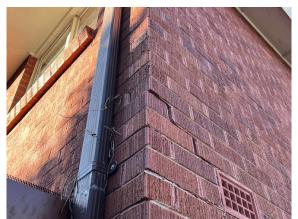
Cracking and rotation of brickwork in south-western corner of the residence
